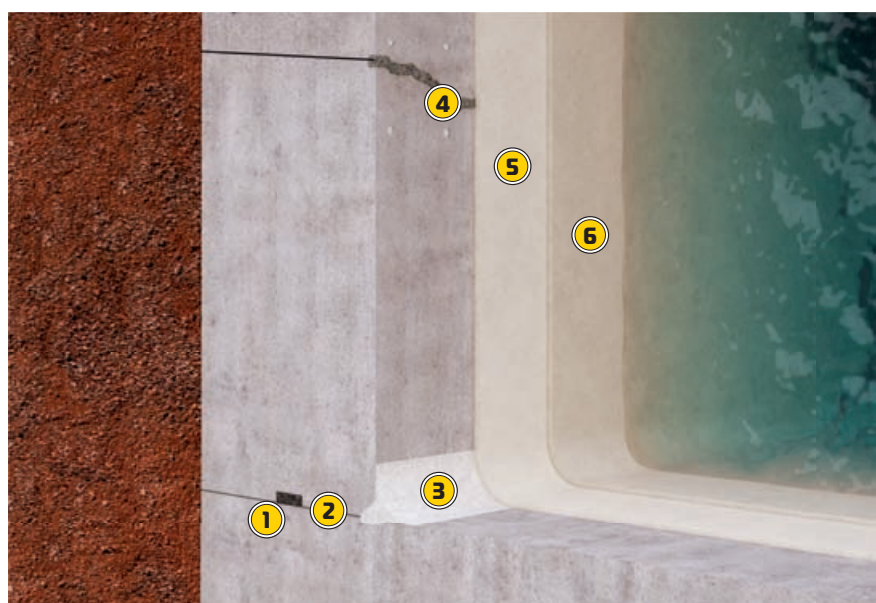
DETAIL OF SEALING OF CONCRETE CONSTRUCTIONS
